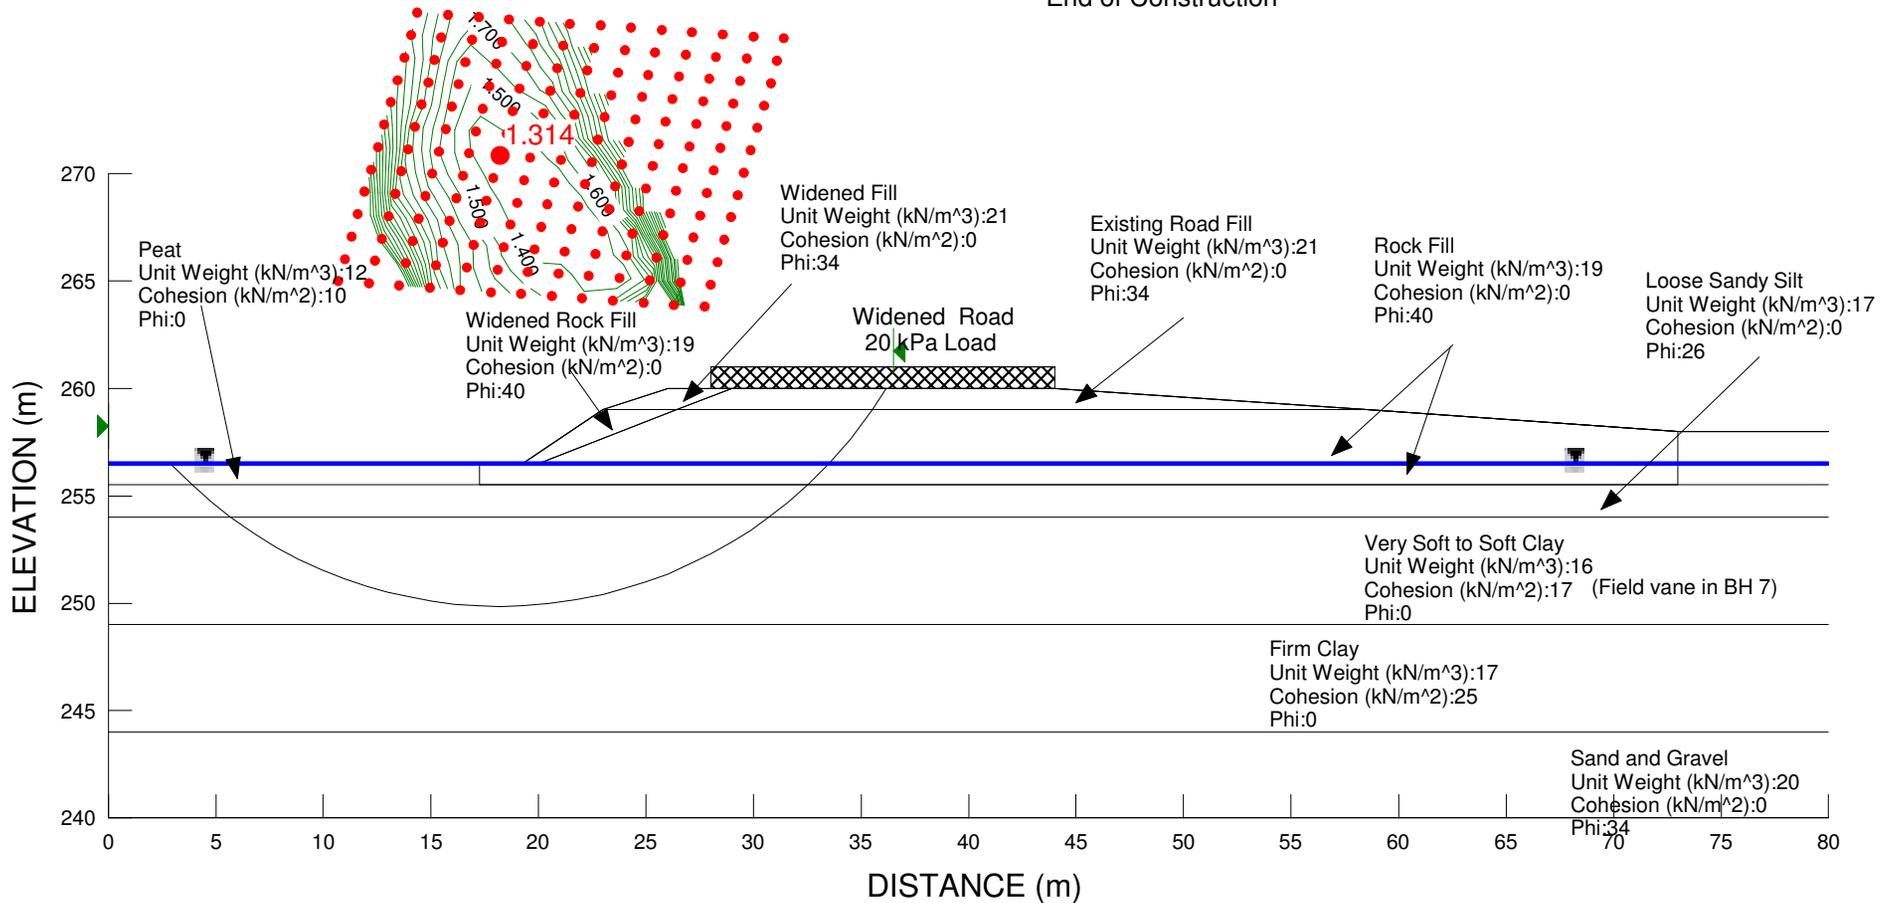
Slope Stability Analysis of Section at Station 18+975 - 2.5 m Road Widening (End of Construction - Slip Surface within Westbound Lane)
